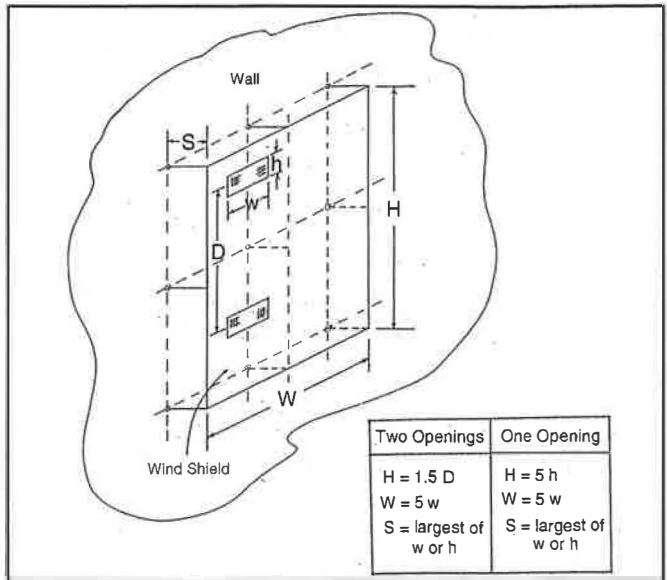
Recommended dimensions for wind shields placed symmetrically over combustion air openings.
